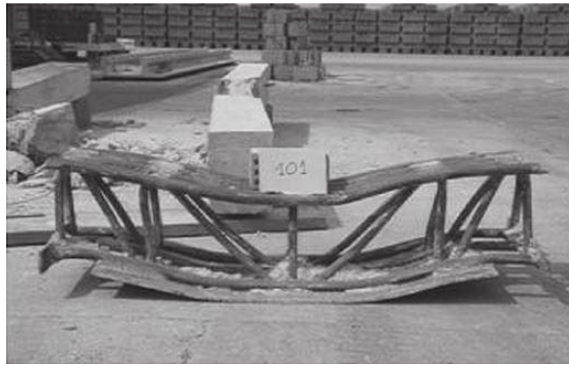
Deformed shape of the steel truss at the end of the test.
